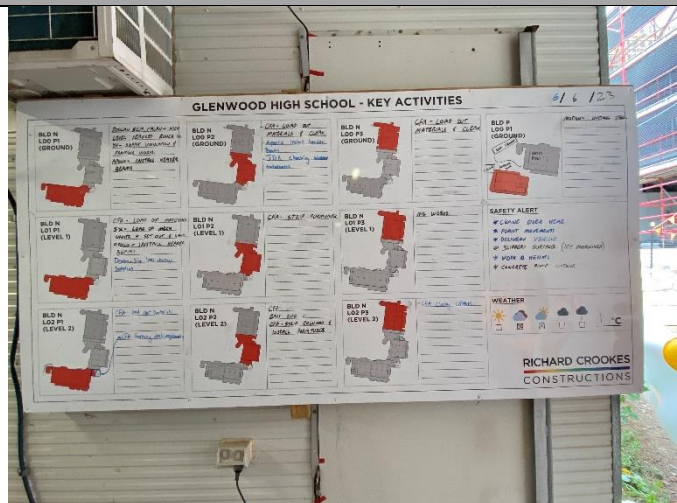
Daily pre-start notice board tracking construction stages and daily issues
